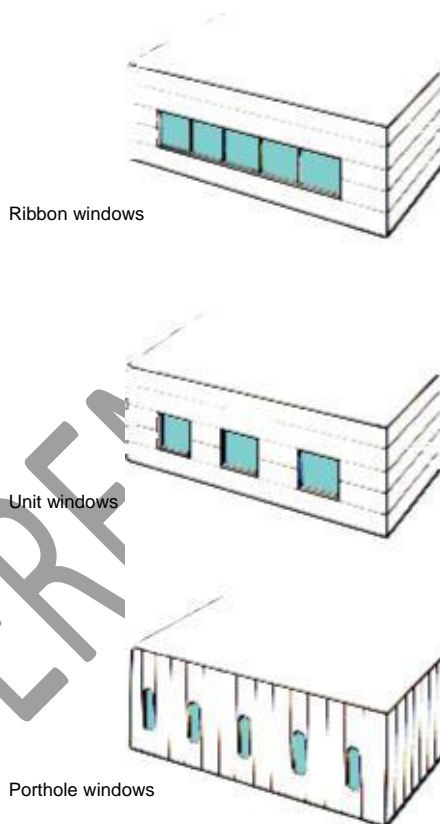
TYPICAL WINDOW CONFIGURATIONS
